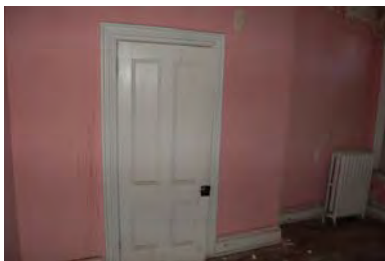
South wall with plaster water damage. (Photo: BBB, 2007)
